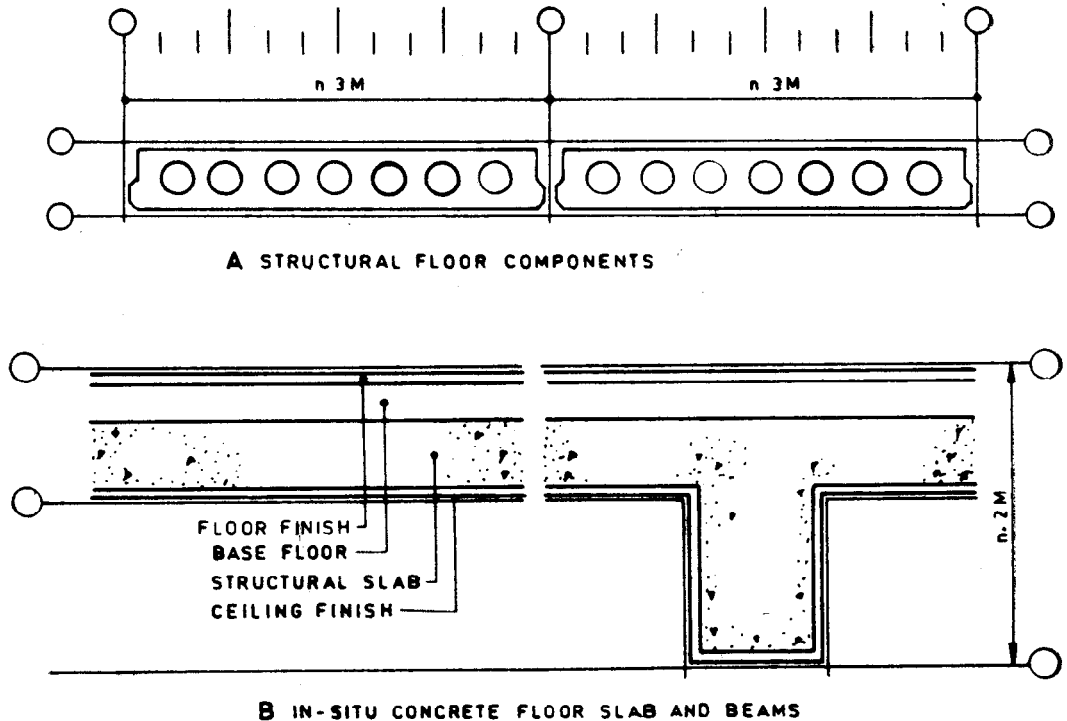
MODULAR OR NON-MODULAR FLOOR HEIGHTS
